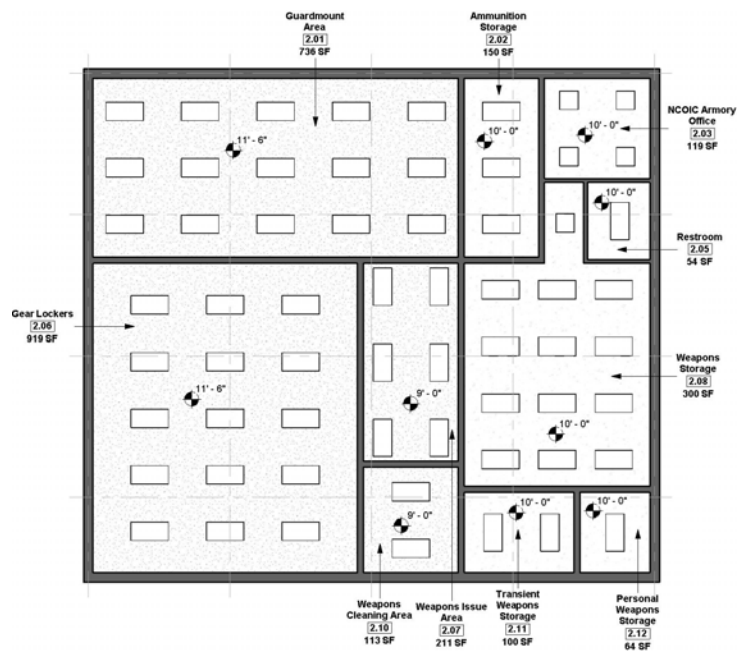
Module 2: Guardmount/ Armory – Reflected Ceiling Plan
